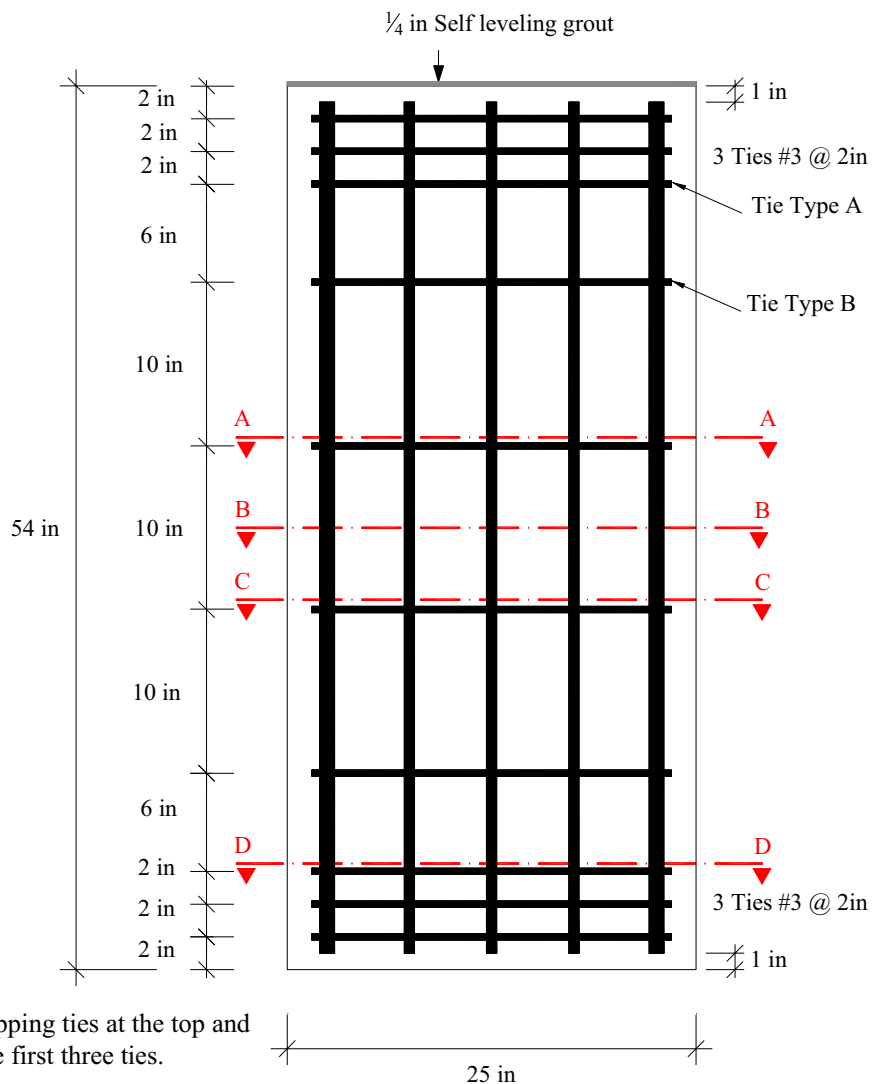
Longitudinal Cross Section; Specimens B1, B2 & B3
